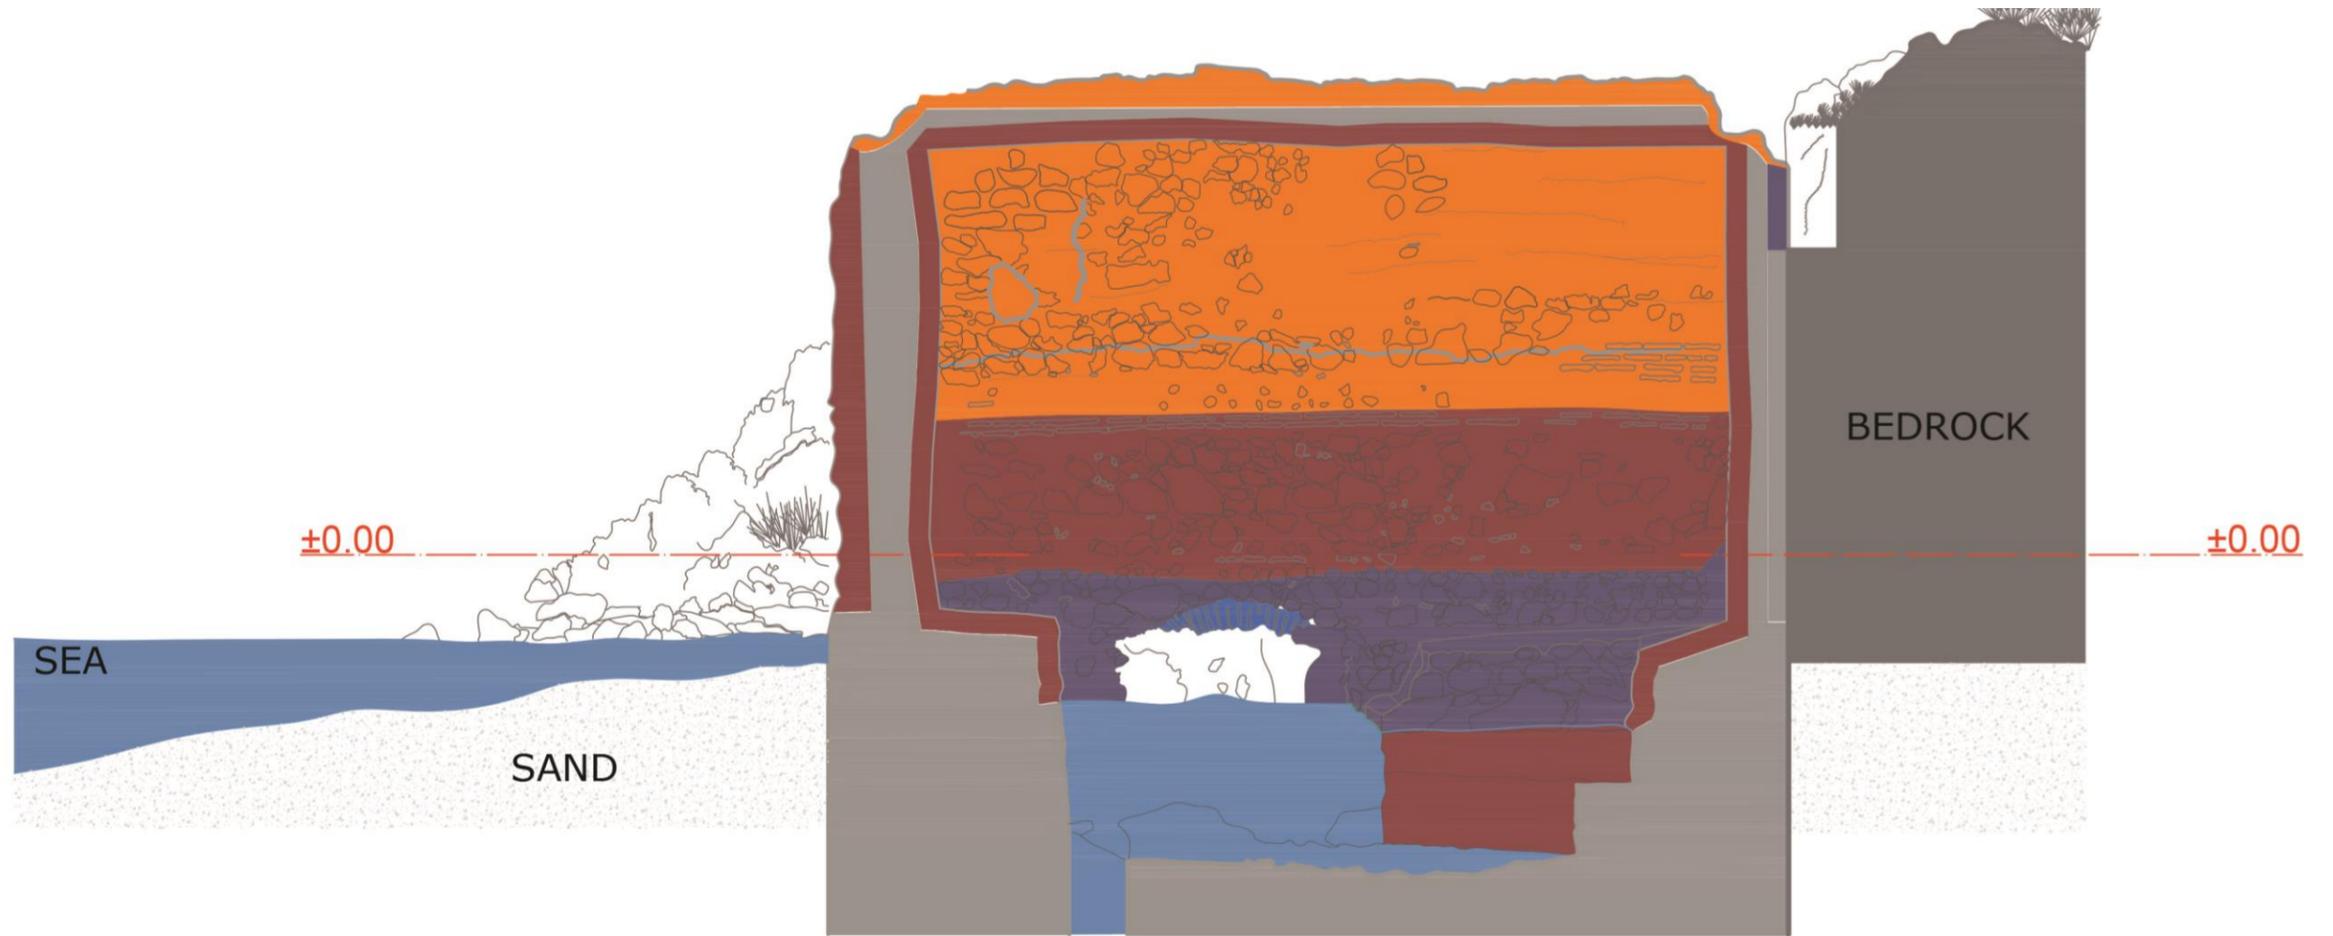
North Elevation - Construction Technique and Material Usage
